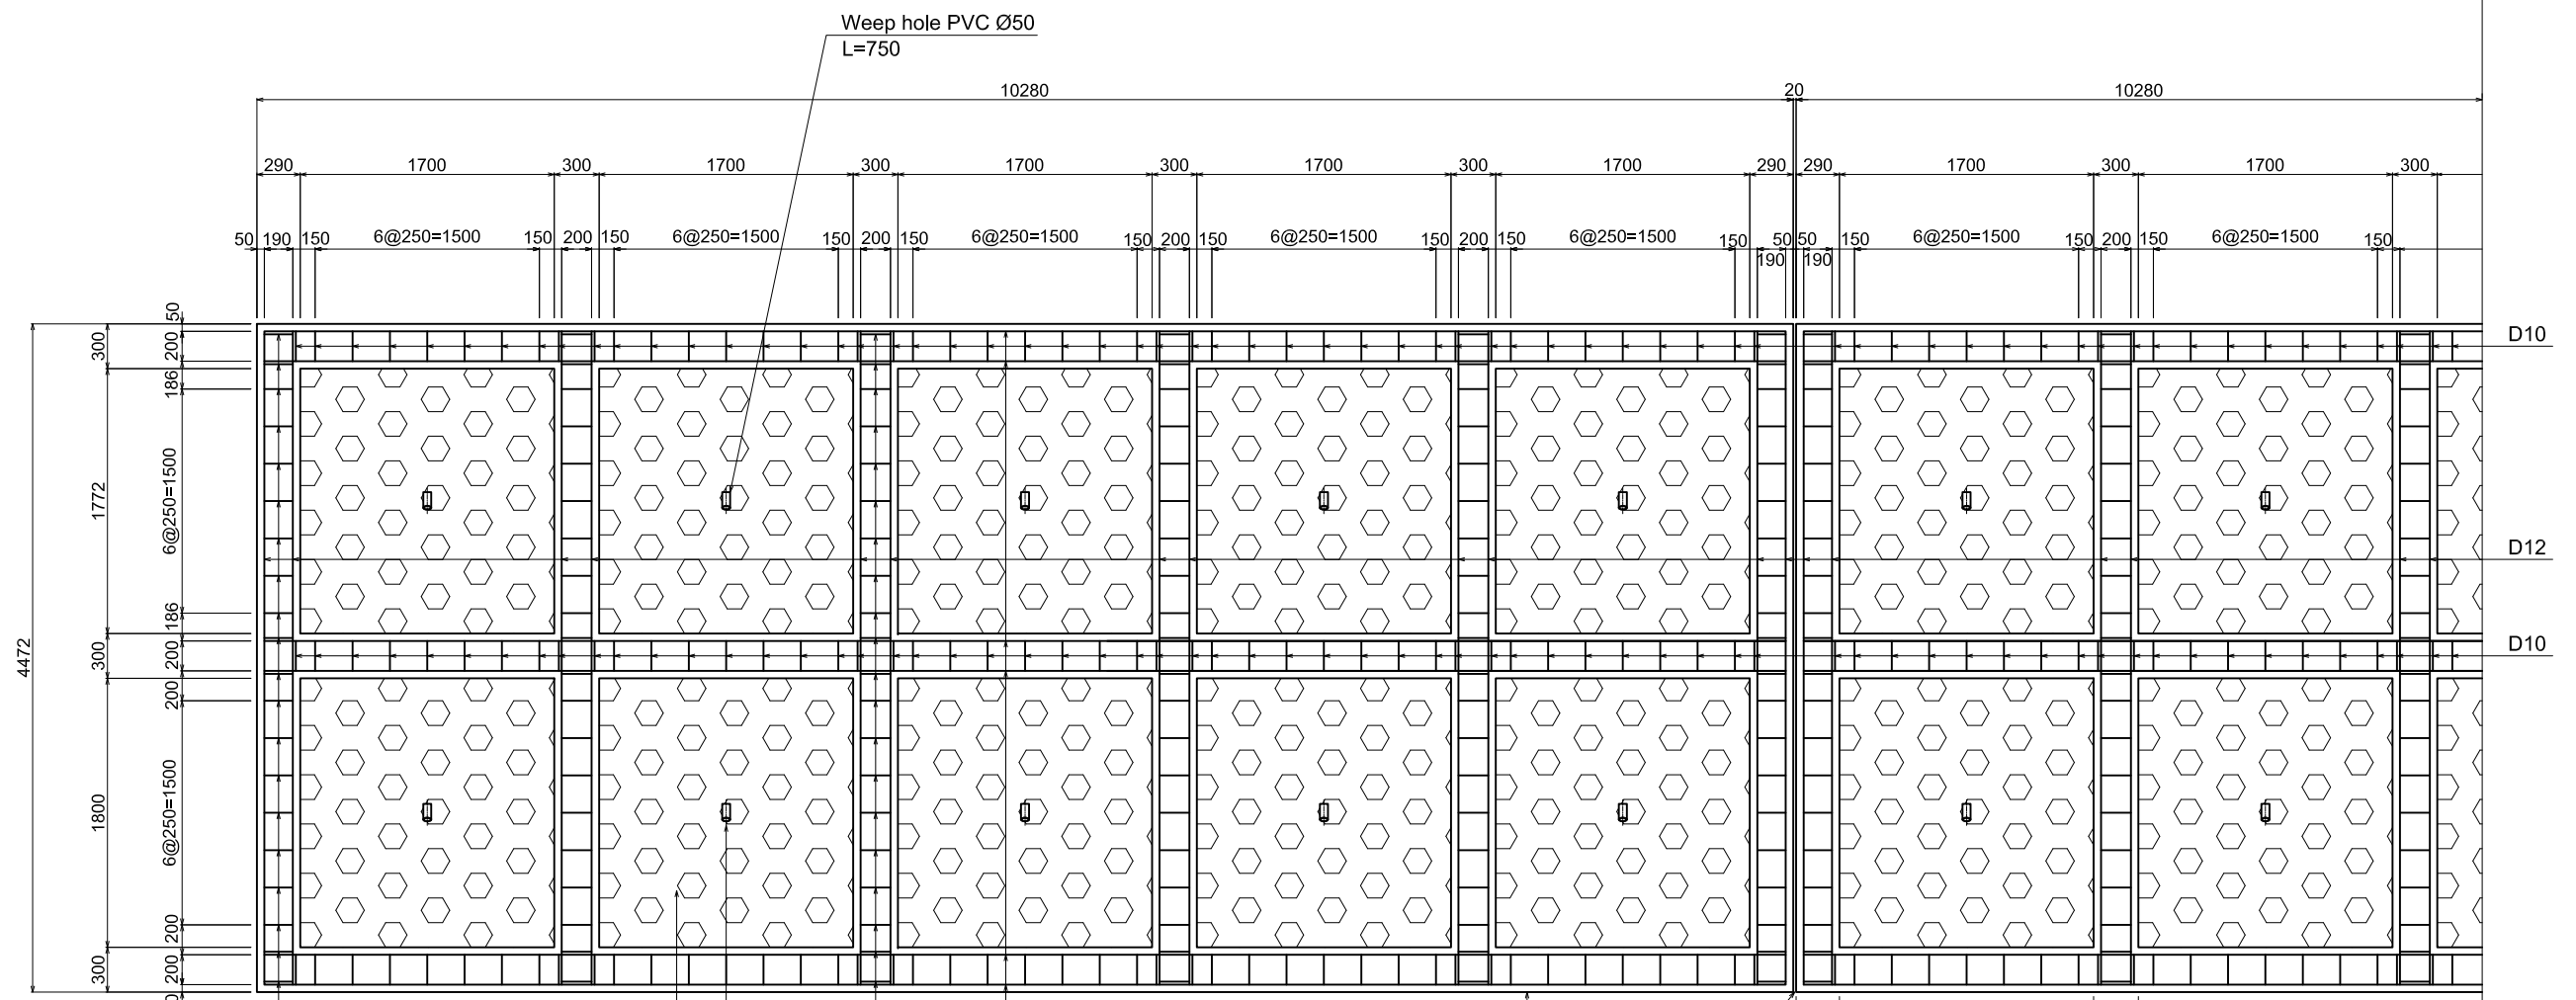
DETAIL F: SLOPE TOP PROTECTION CONCRETE
